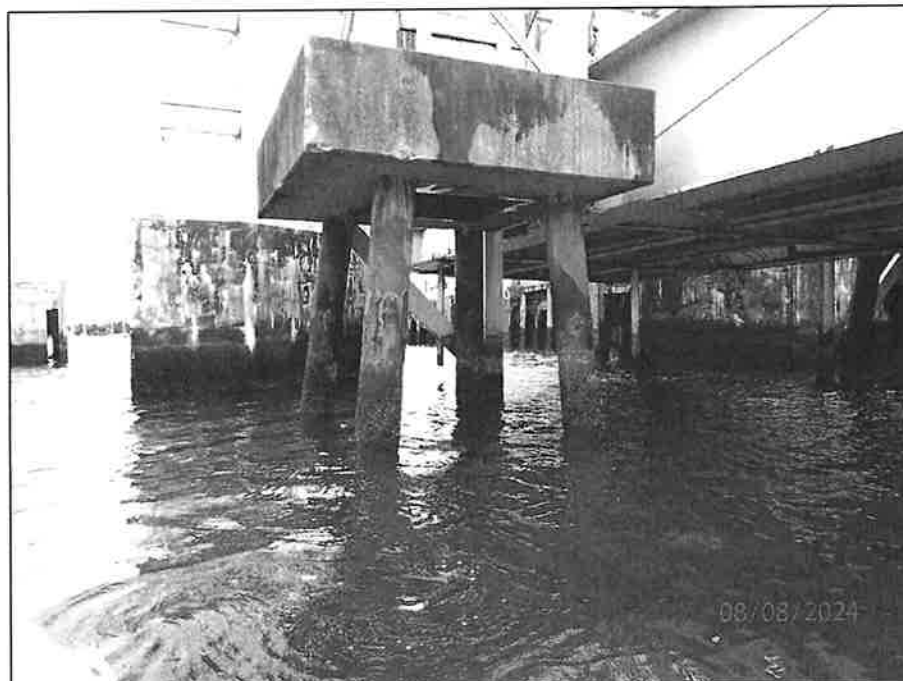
Hoist Tower Dolphin looking east, note minor spalls at base of concrete
